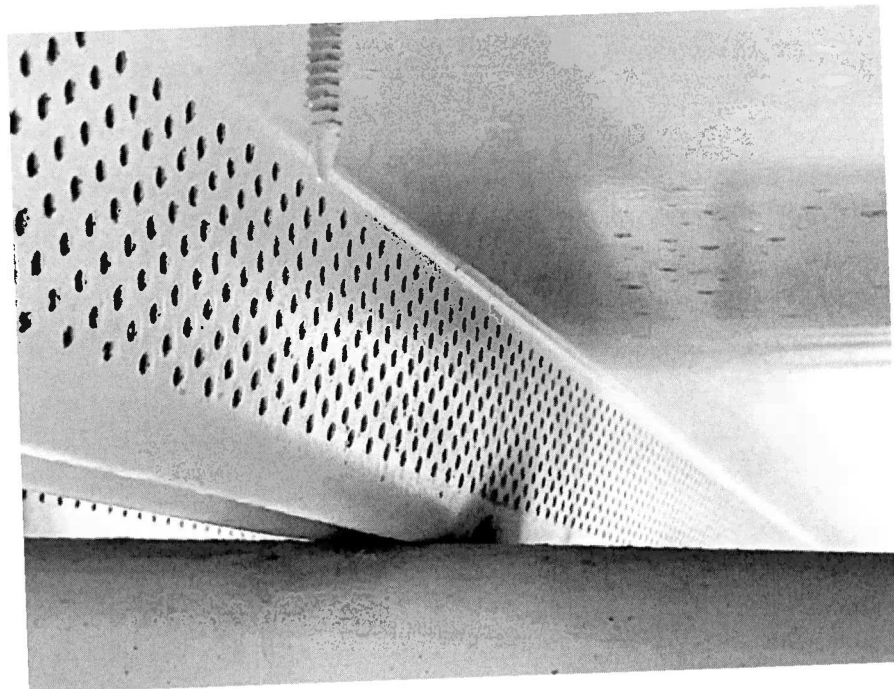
Lightly damaged roof deck bearing at north-west truss
